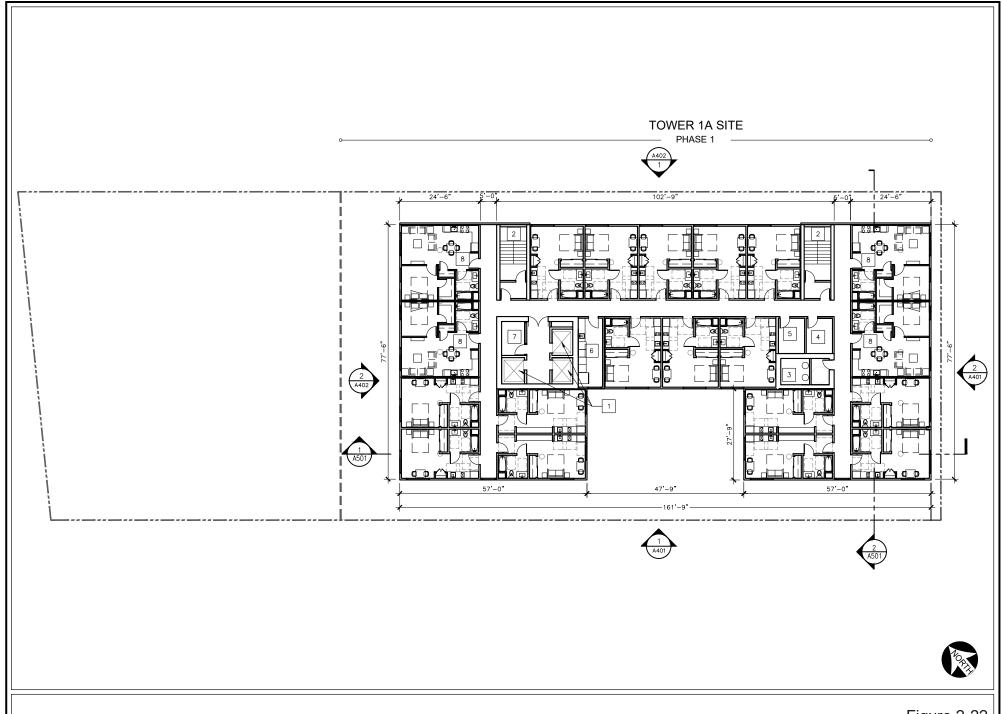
Level 14 and 15 Floor Plan - Site 1
